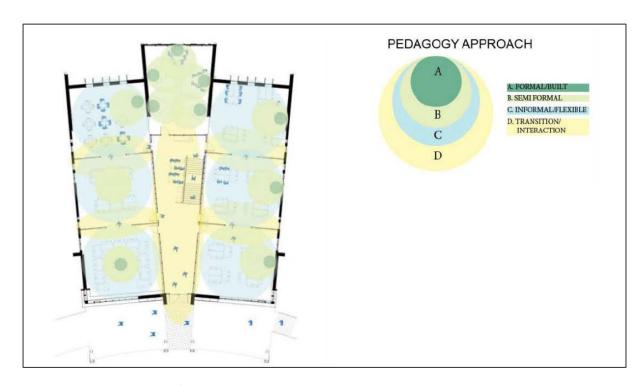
| Typical high school building flexible use layout plan (source: RtS 2019)
